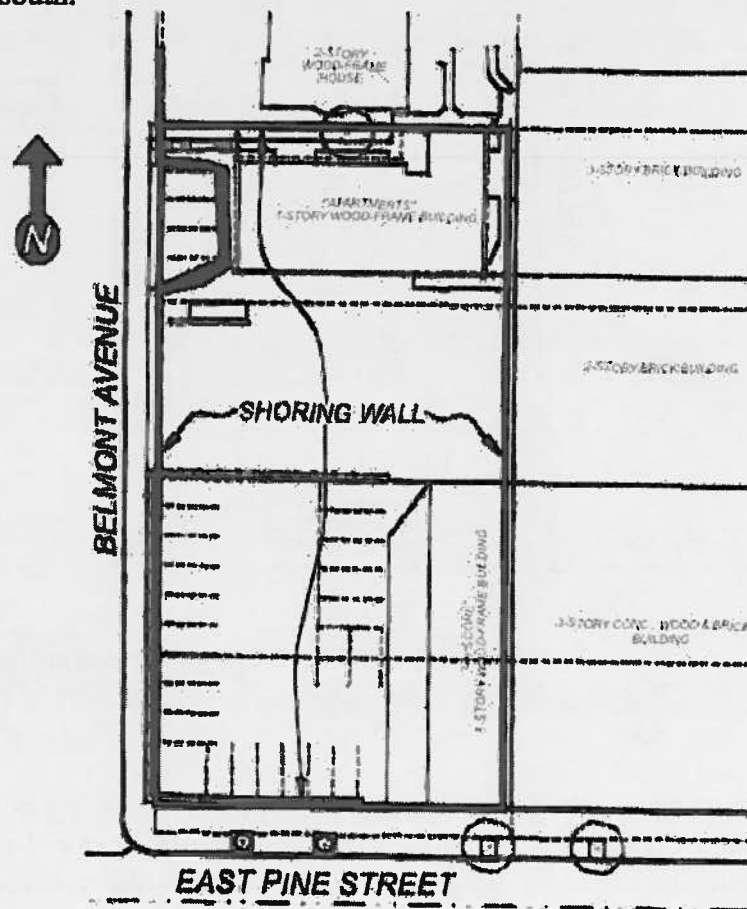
Footprint Of The Press I Excavation Shoring Wall. Existing Features Shown From The Topographical Survey Map Prepared For This Site
